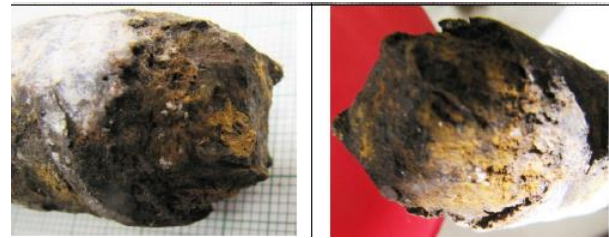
Picture of the two sides of a steel bar ø20 picked up from the zone of failure between the stem base and the foundation of the collapsed wall (courtesy of Fratesi 2018)
